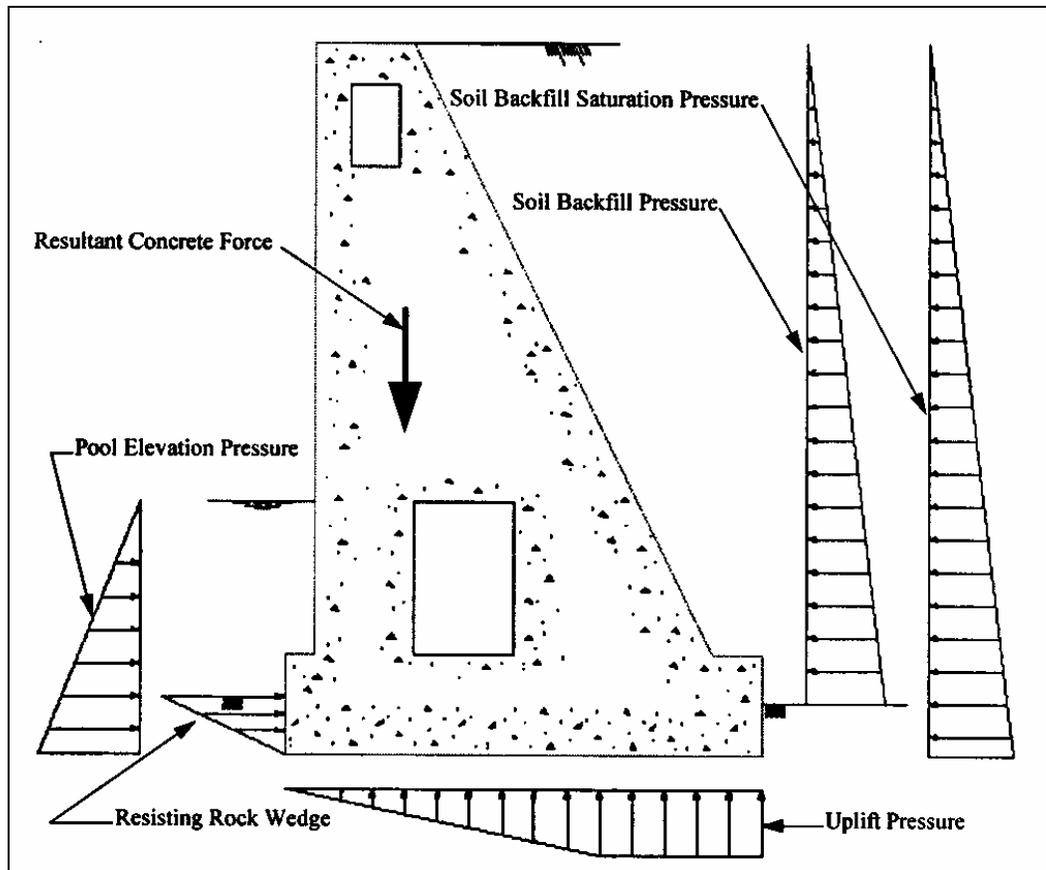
Typical free-body diagram for concrete gravity lock wall monolith
